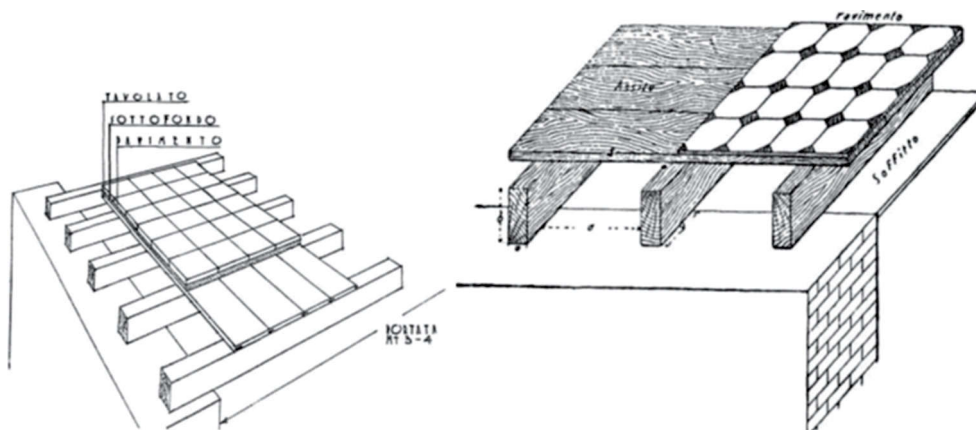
One-way historical timber joisted floor (left photo from [14], right photo from [15])
